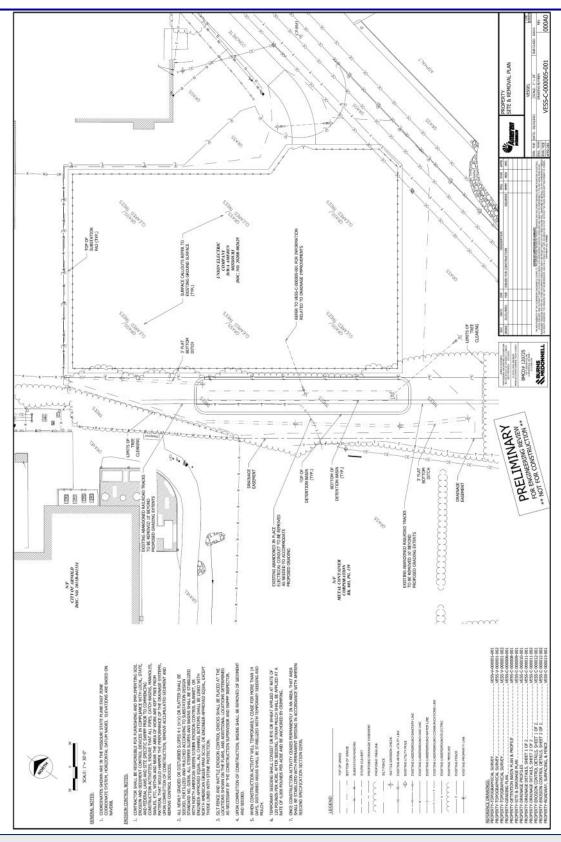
EXHIBIT B: CIVIL PLANS, 1 (SITE & REMOVAL PLAN)
